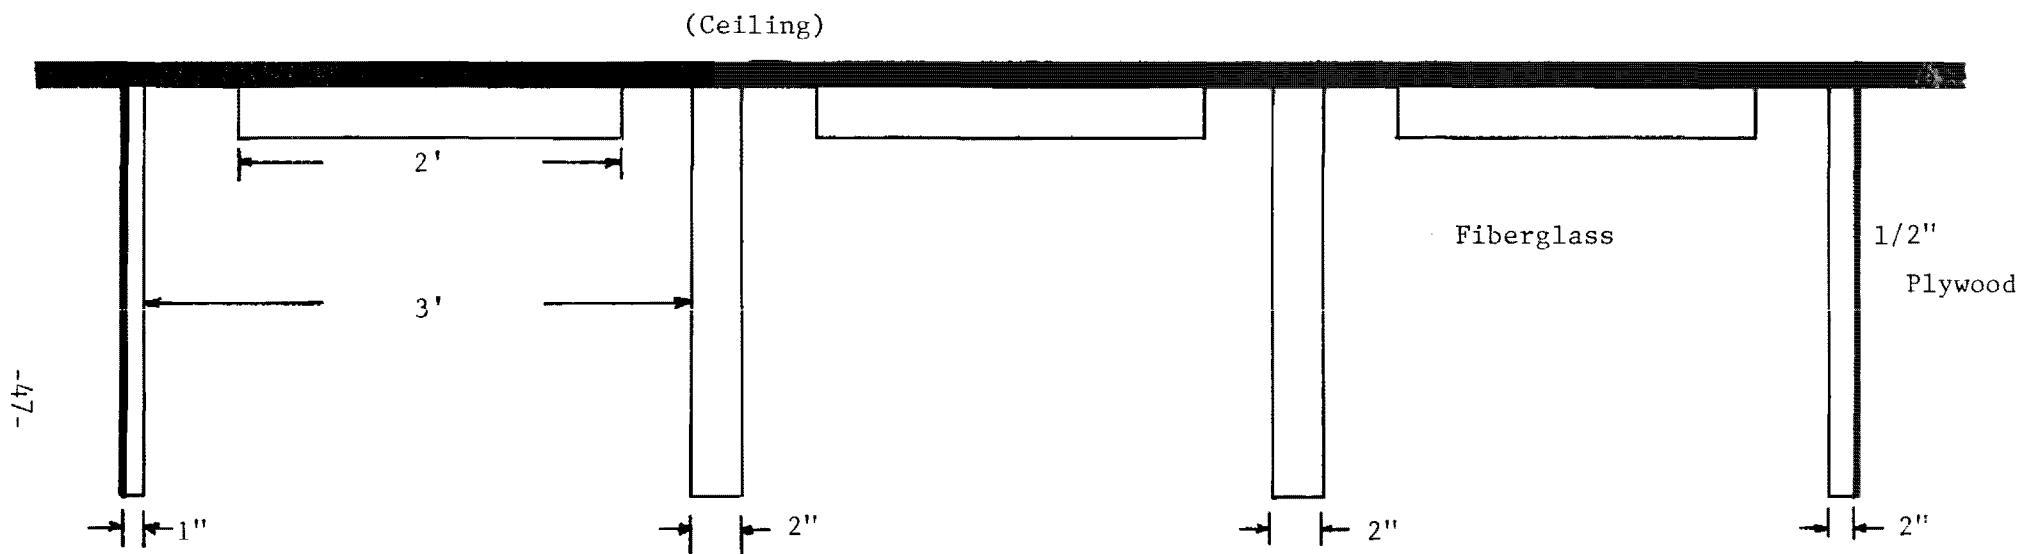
Schematic of Panel Spacing Test with Ceiling Panels Added
